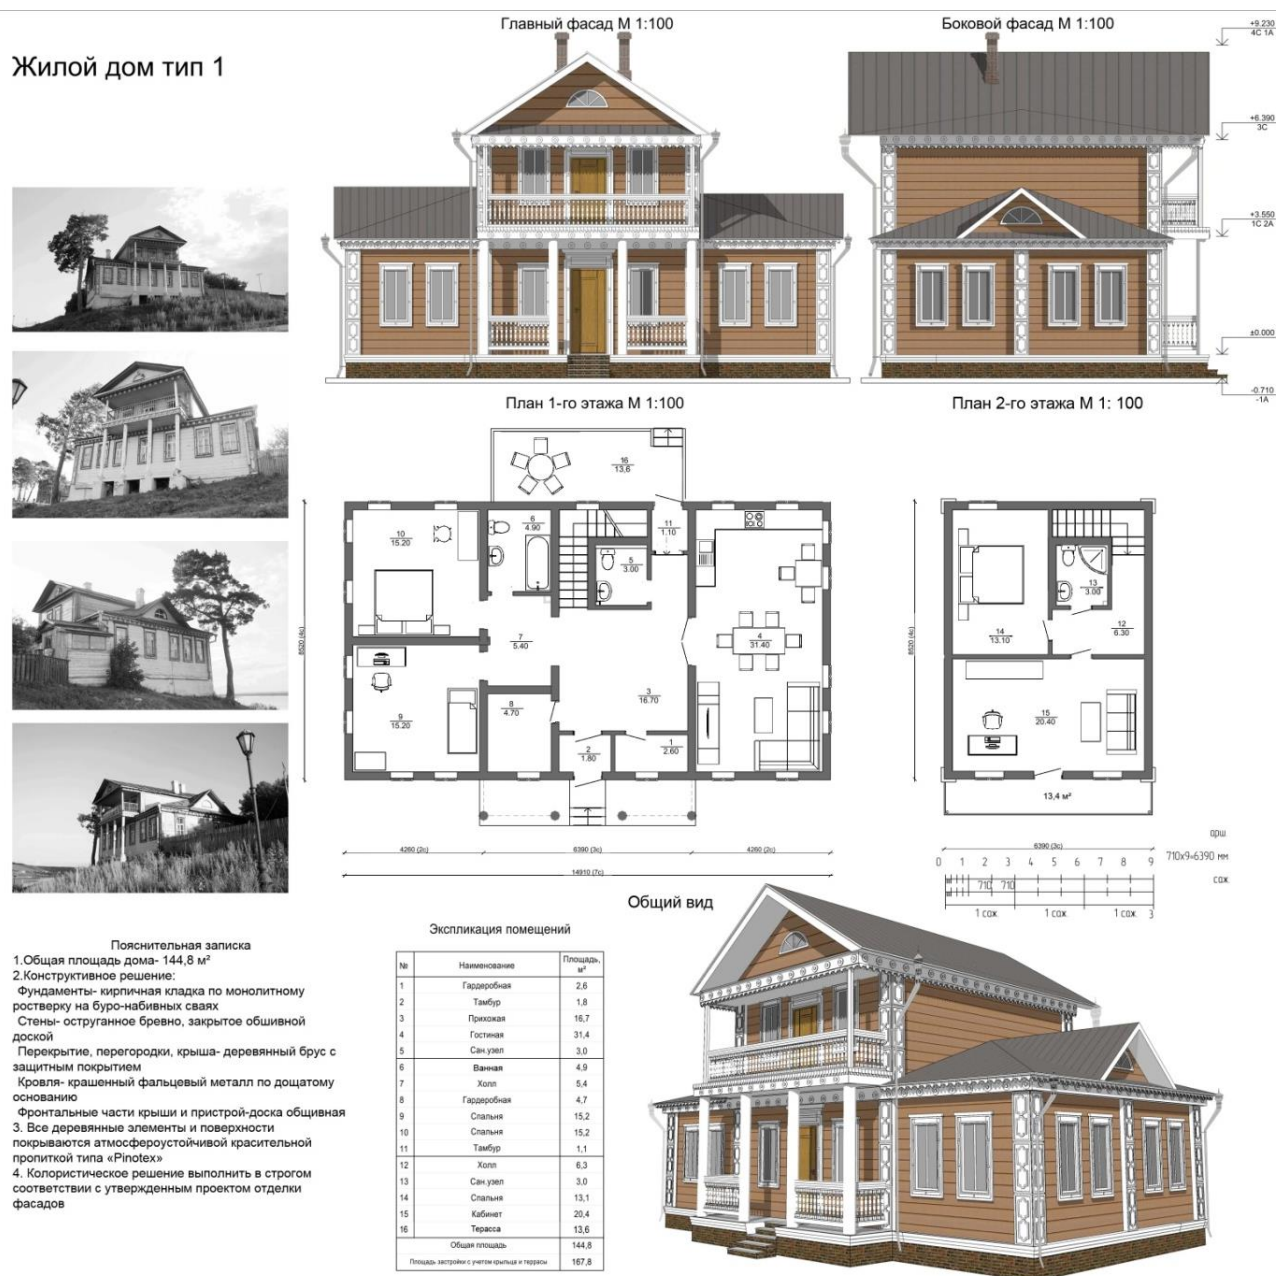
Model House Type 1: one-storey residential building with a mezzanine: main façade, side façade, the first floor plan, the second floor plan and general view. The total area of the house is 144.8 sq.m.
